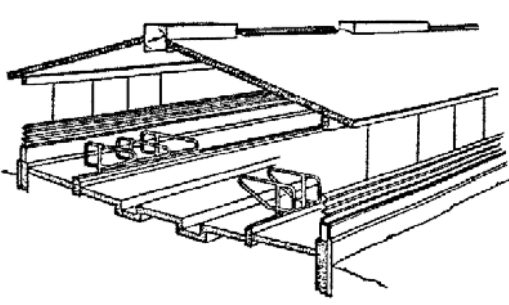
Barn with insulated cathedral ceiling and intermittent ridge openings.
